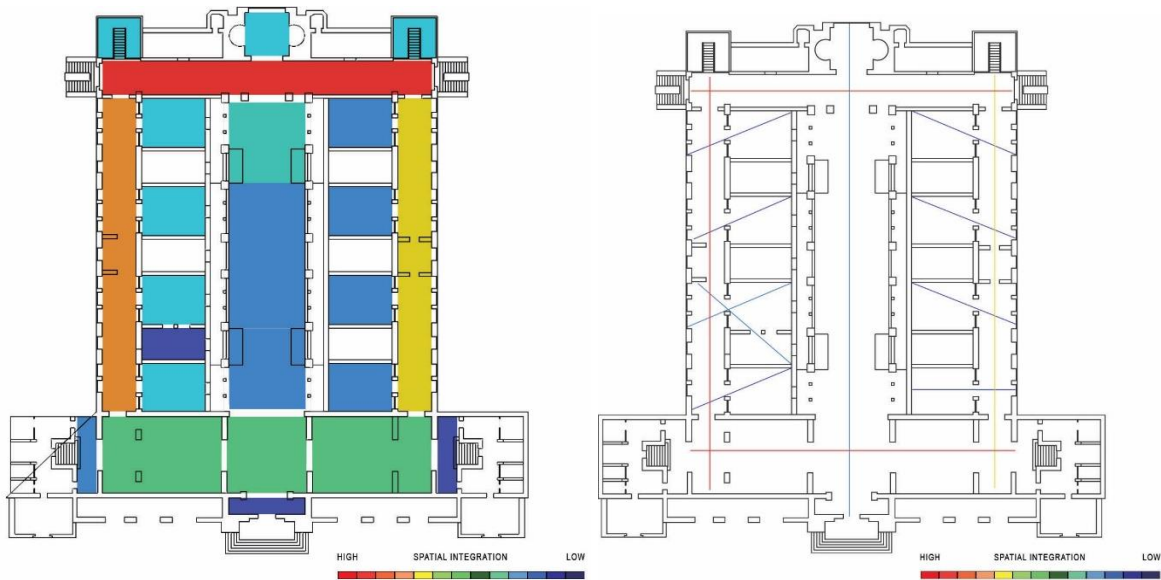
Ground Floor plan of the Egyptian Museum of Antiquities (Author).
